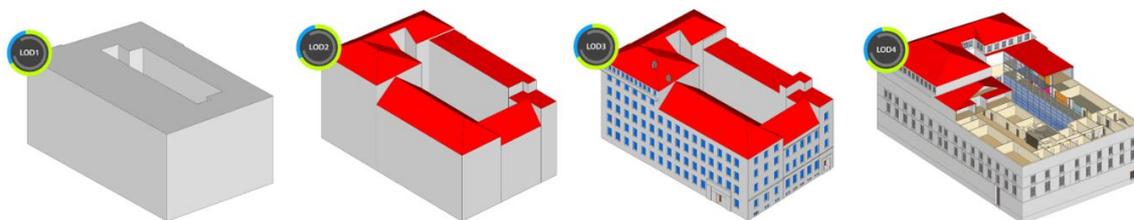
A building of the Hochschule für Technik Stuttgart in different Level of Detail [adopted from: 4]
